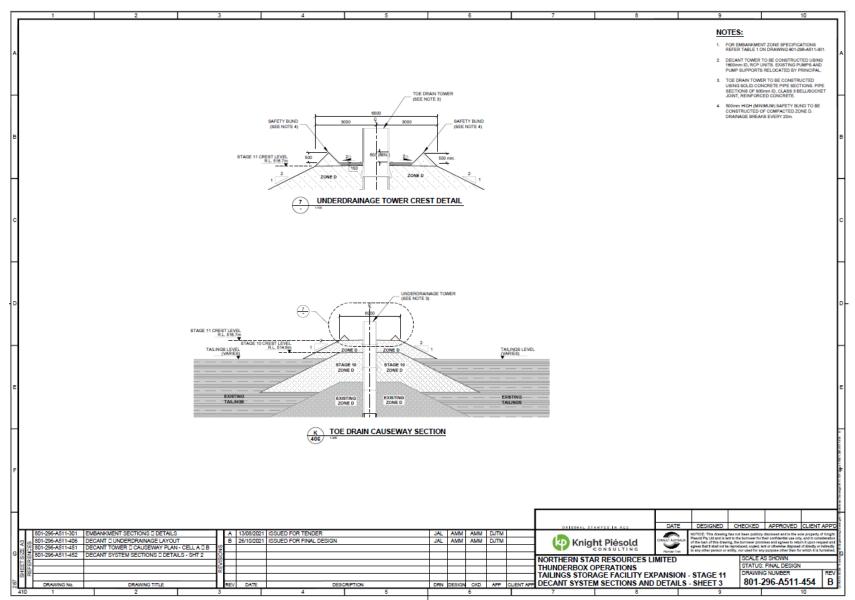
Stage 10 and 11 underdrainage tower and toe drain causeway section
